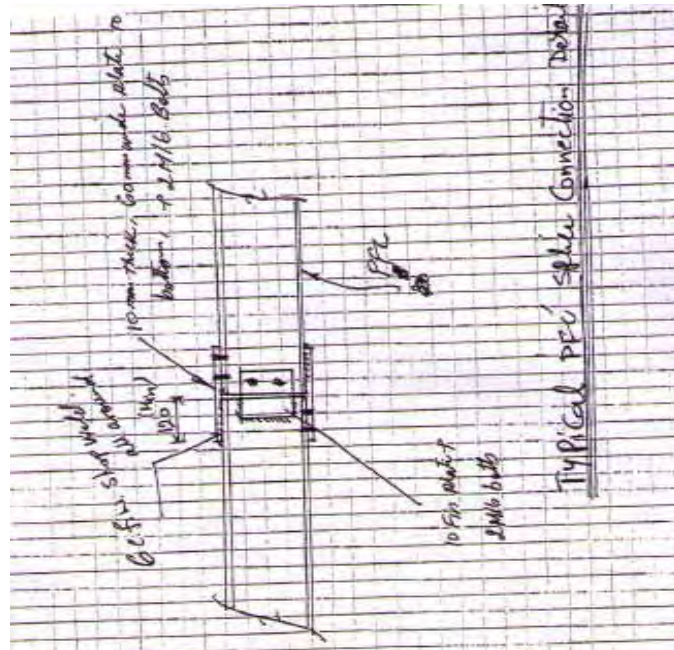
Sketch of new PFC to replace the corroded single length span PFC.
